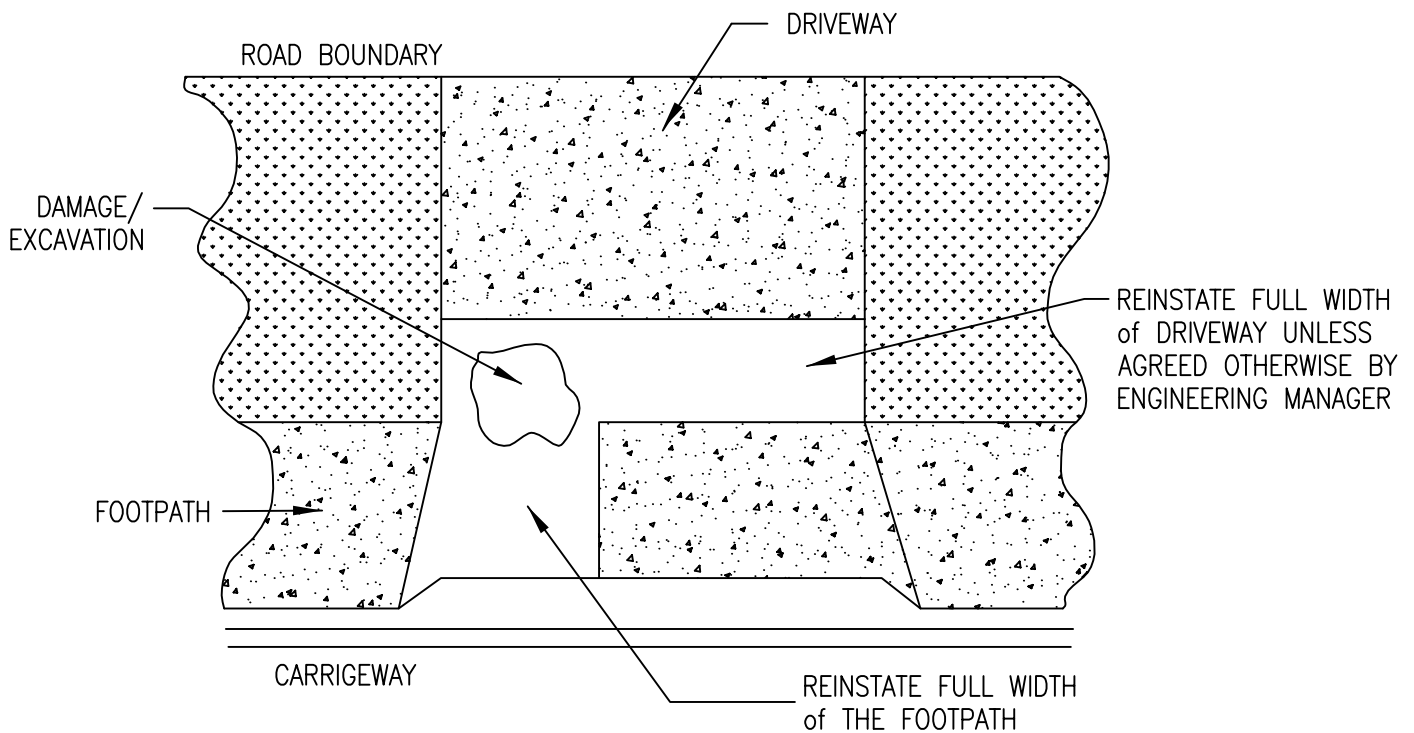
EXCAVATION IN FOOTPATH OR DRIVEWAY
